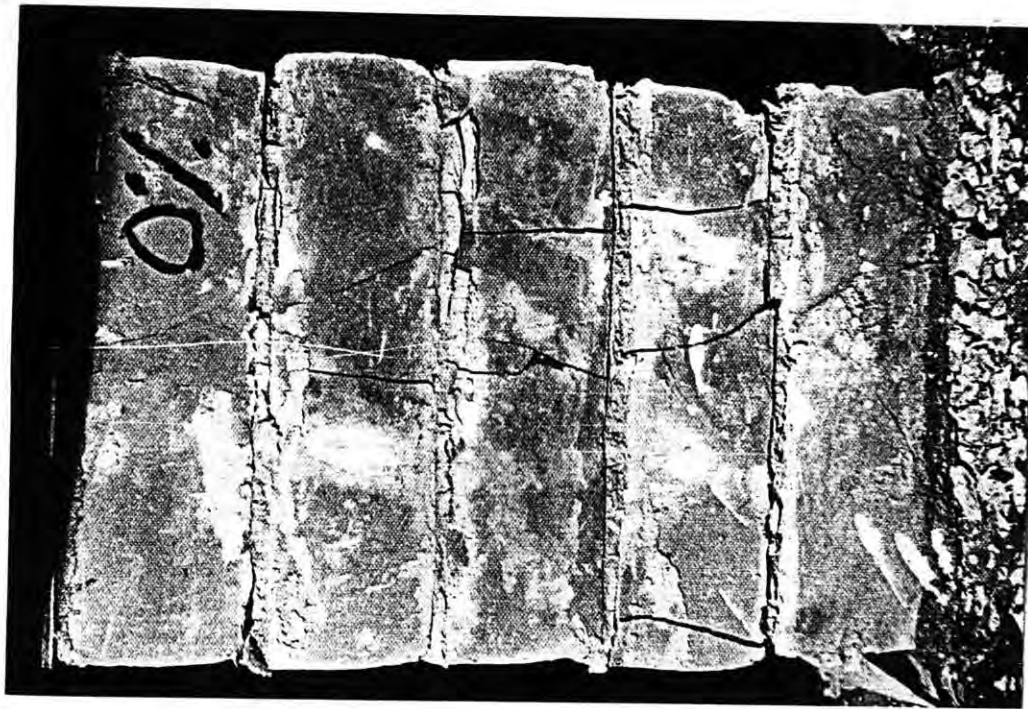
Typical Failure Pattern of Stack Bonded Prism with Mud Mortar.
